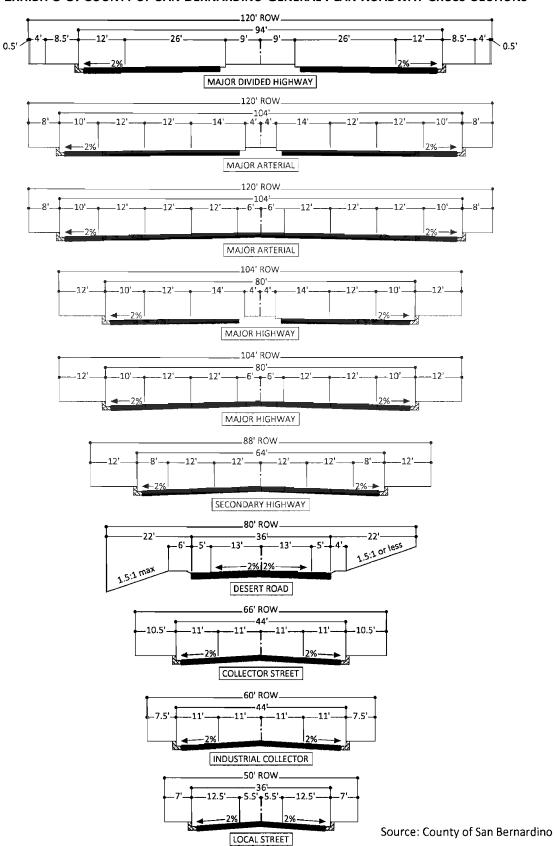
COUNTY OF SAN BERNARDINO GENERAL PLAN ROADWAY CROSS-SECTIONS
